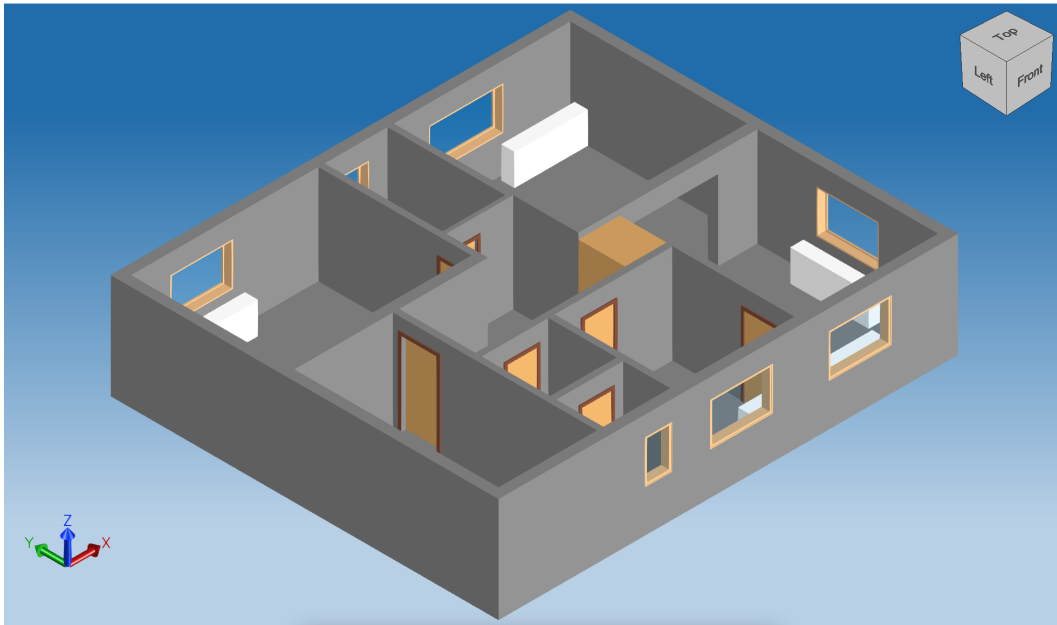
Rendering of first building level from Open Smart Home Data [24]
